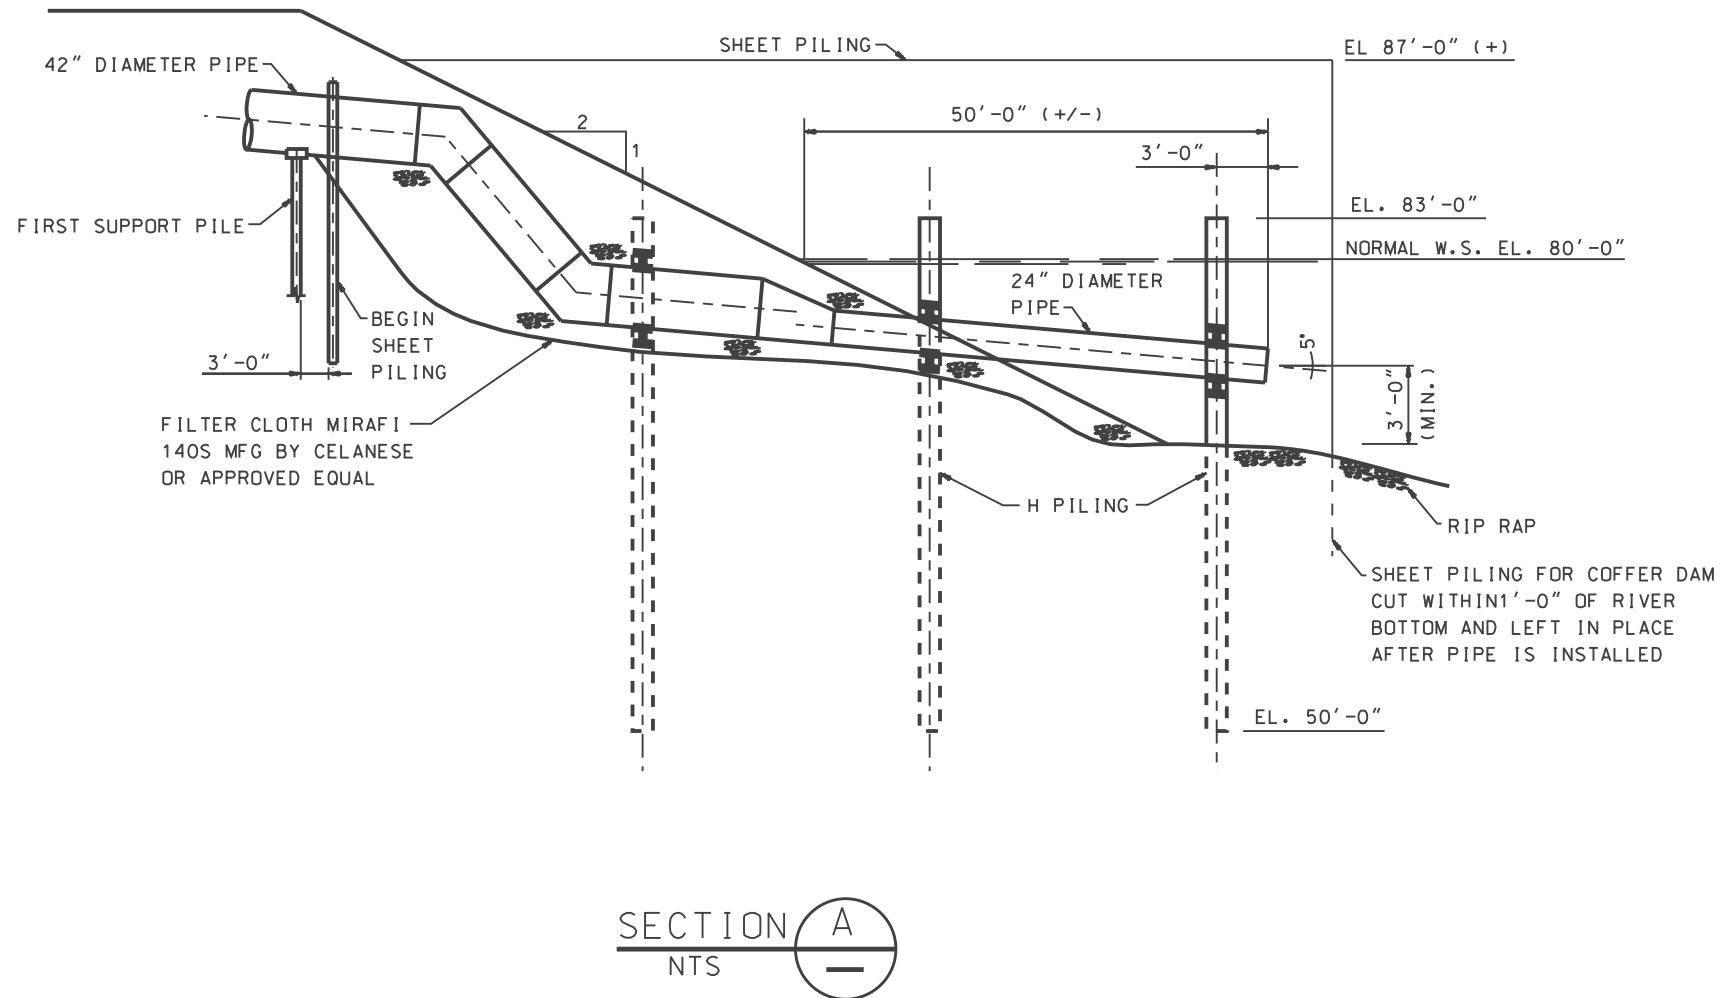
Section View of New Discharge Outfall for the Discharge System
